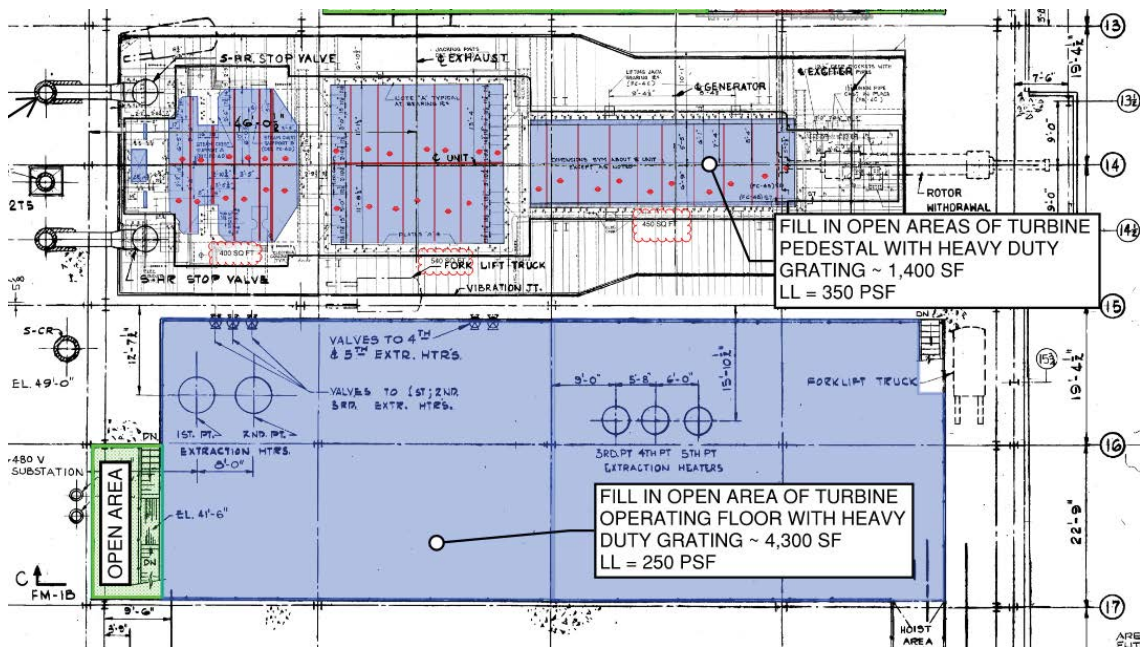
Turbine Building Operating Floor In-Fill Areas
